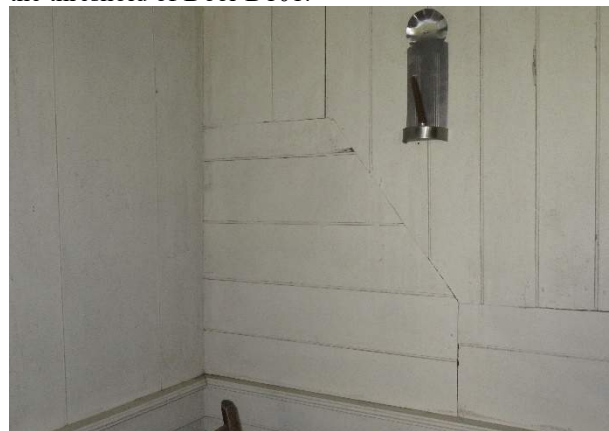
Wall boards on the north wall, believed to be reused historic fabric.
